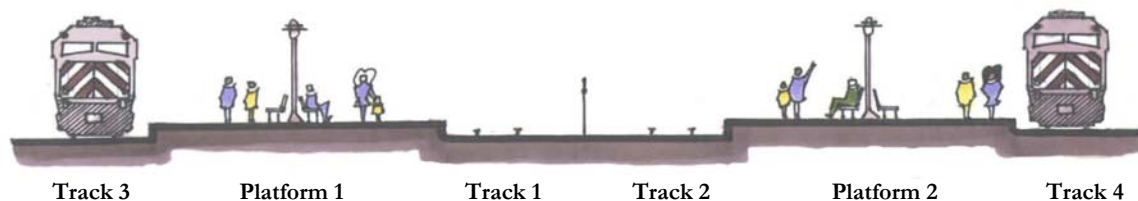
Outside-Boarding (Two) Platforms, Four Tracks
